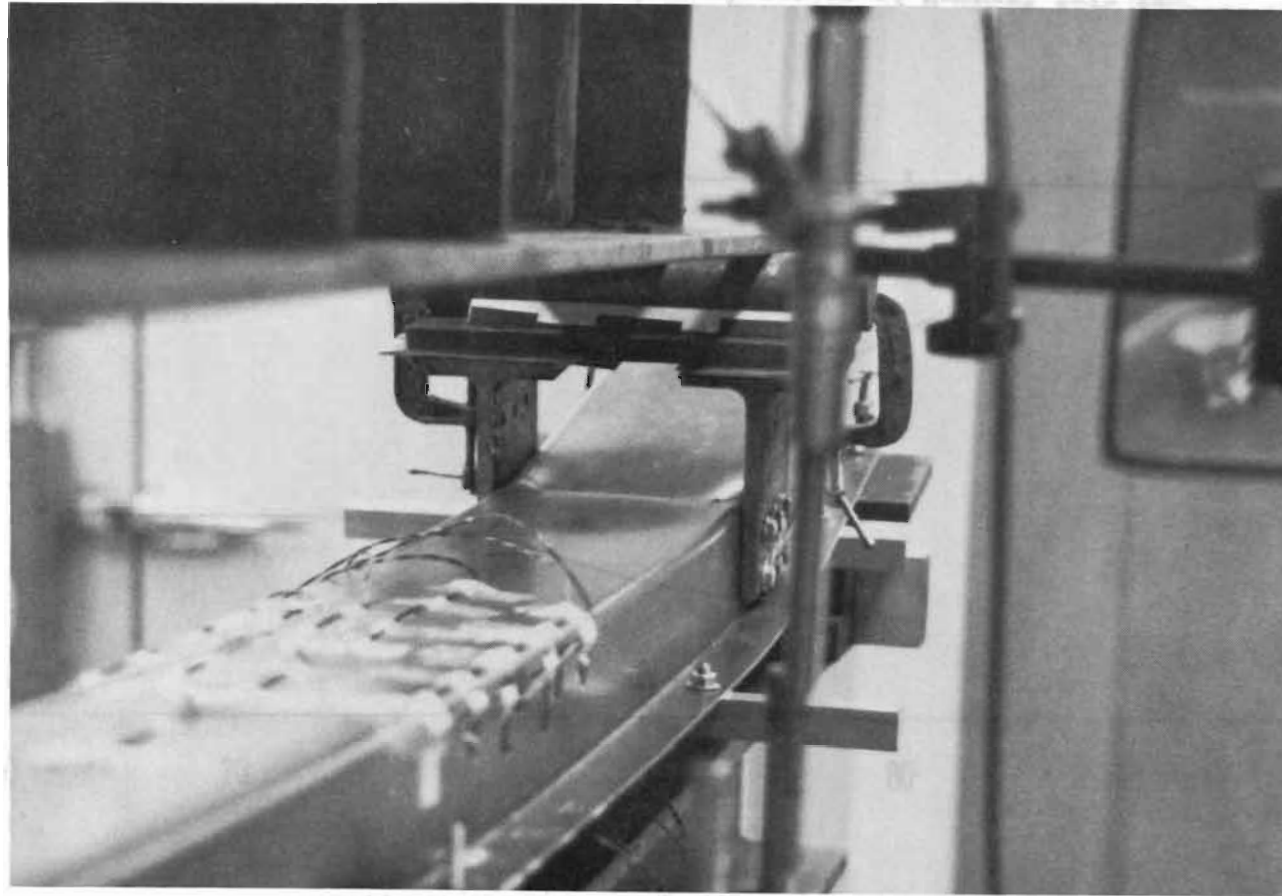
Typical Failure of Hat Beams with a Stiffened Flange
